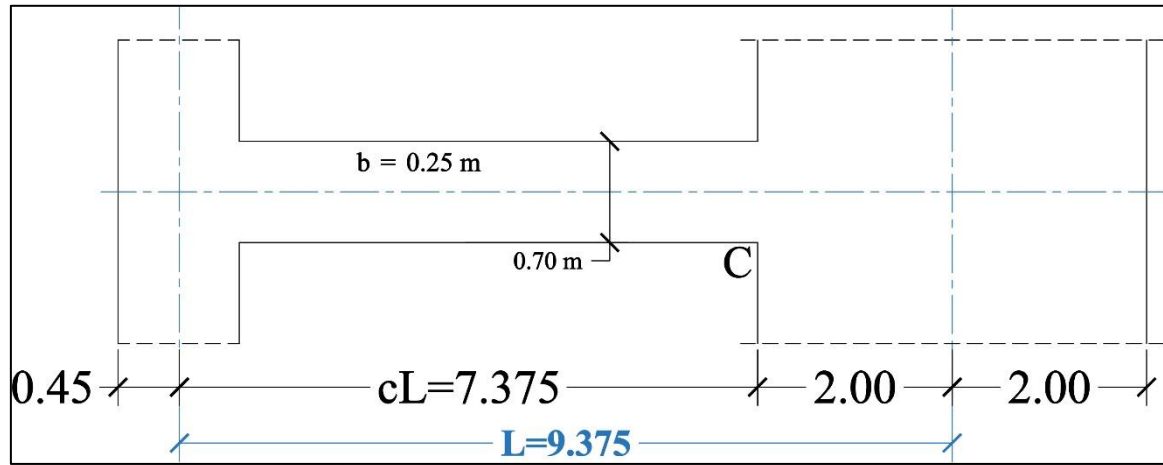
Coupled Beams Connected Between Center Shear Wall and Column (X-Dir.).
